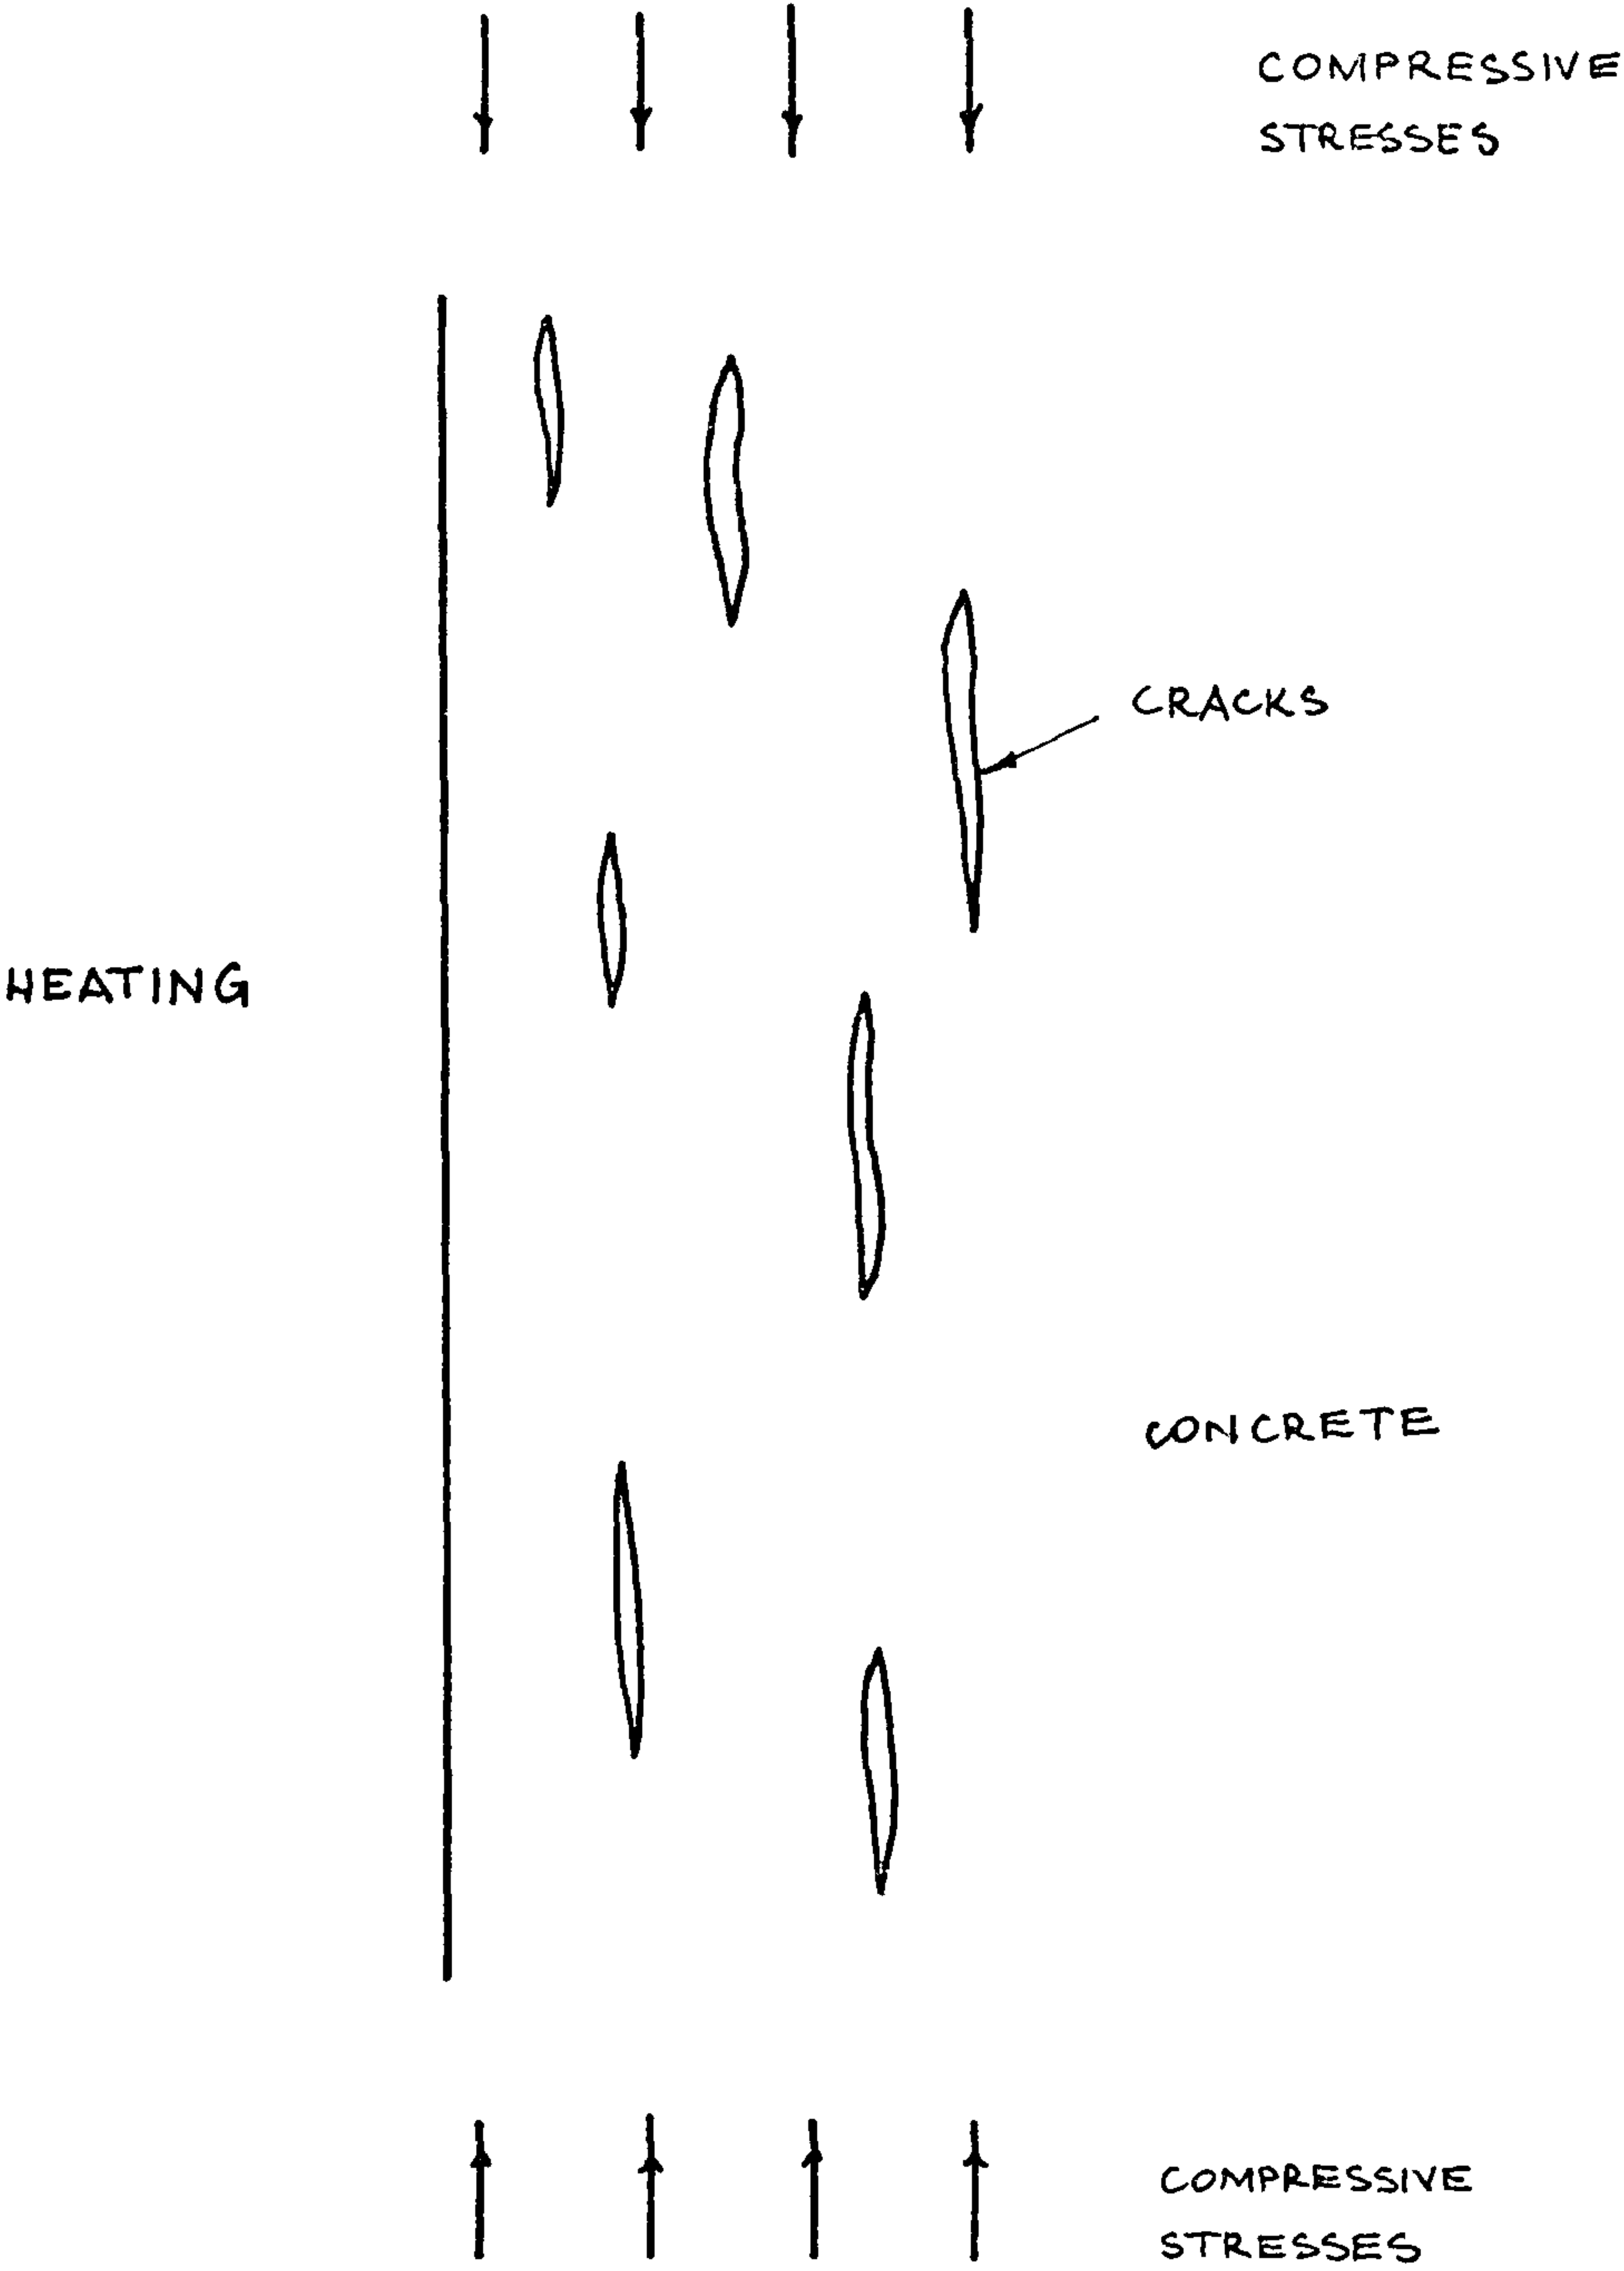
REPRESENTATION OF A CONCRETE WALL PANEL EXPOSED TO HEATING FROM ONE SIDE
